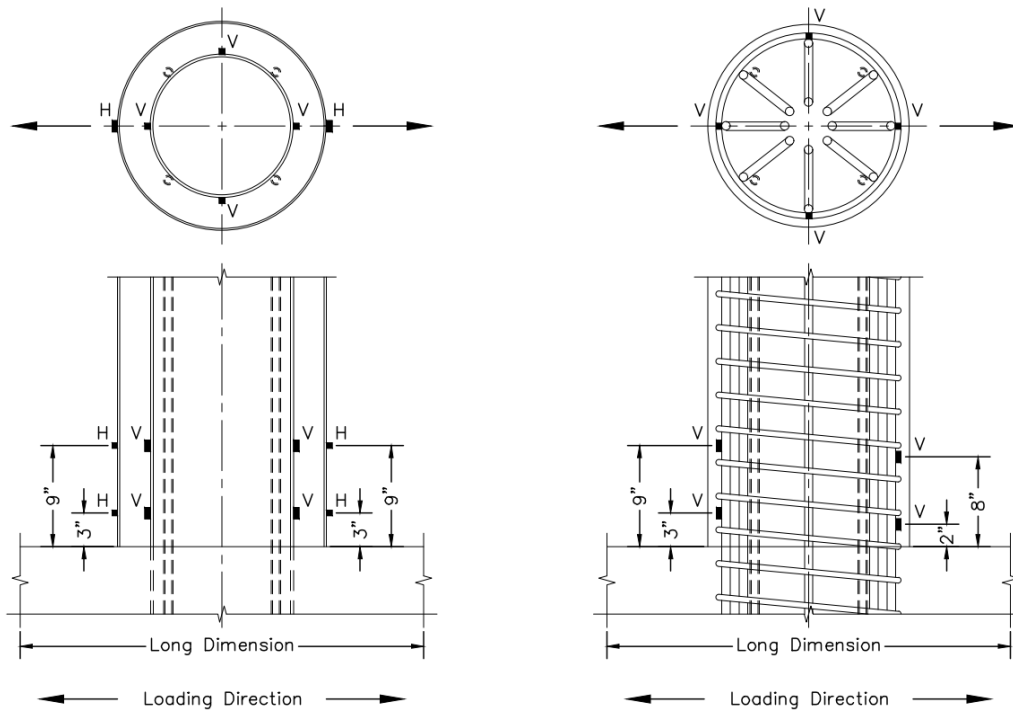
Column Strain Gauge Layout: HC-FCS Column (l), RC Column (r)
